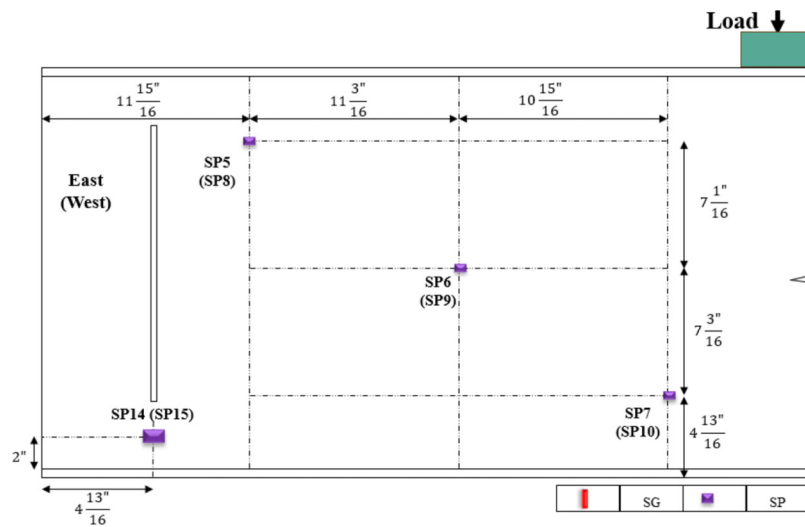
Displacement sensor layout (side elevation): Specimens 1–6.
